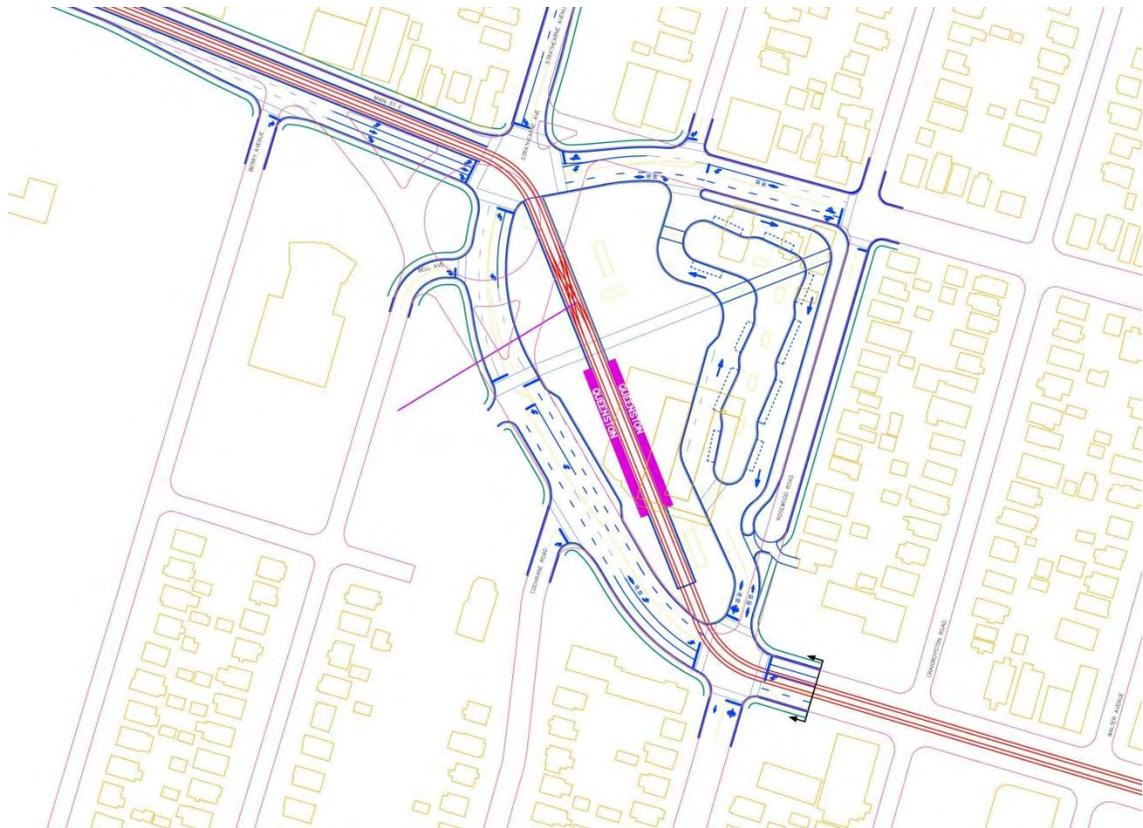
Queenston Bus Terminal Layout Concept Plan
